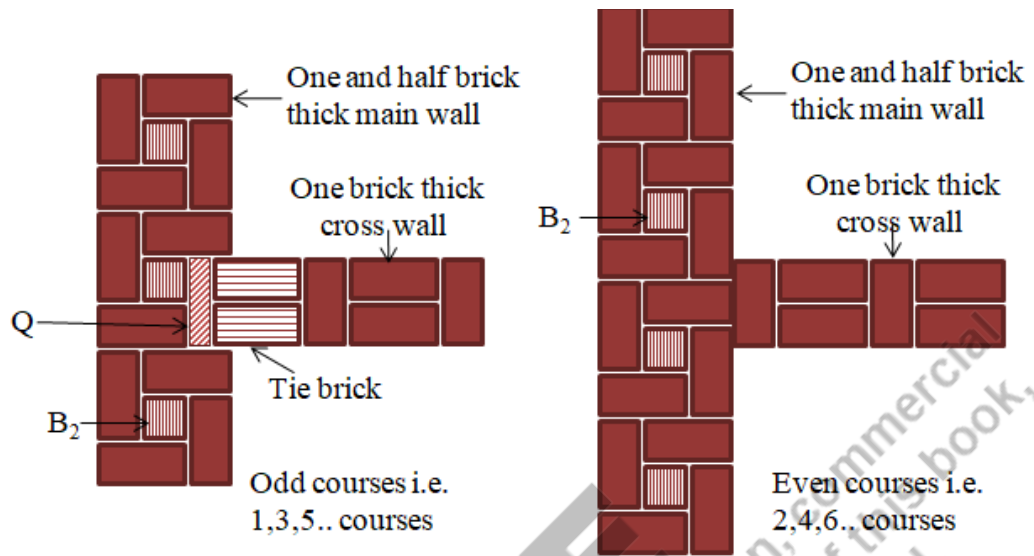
(b) Tee junction between one and a half brick thick wall and one brick thick wall in Flemish bond
